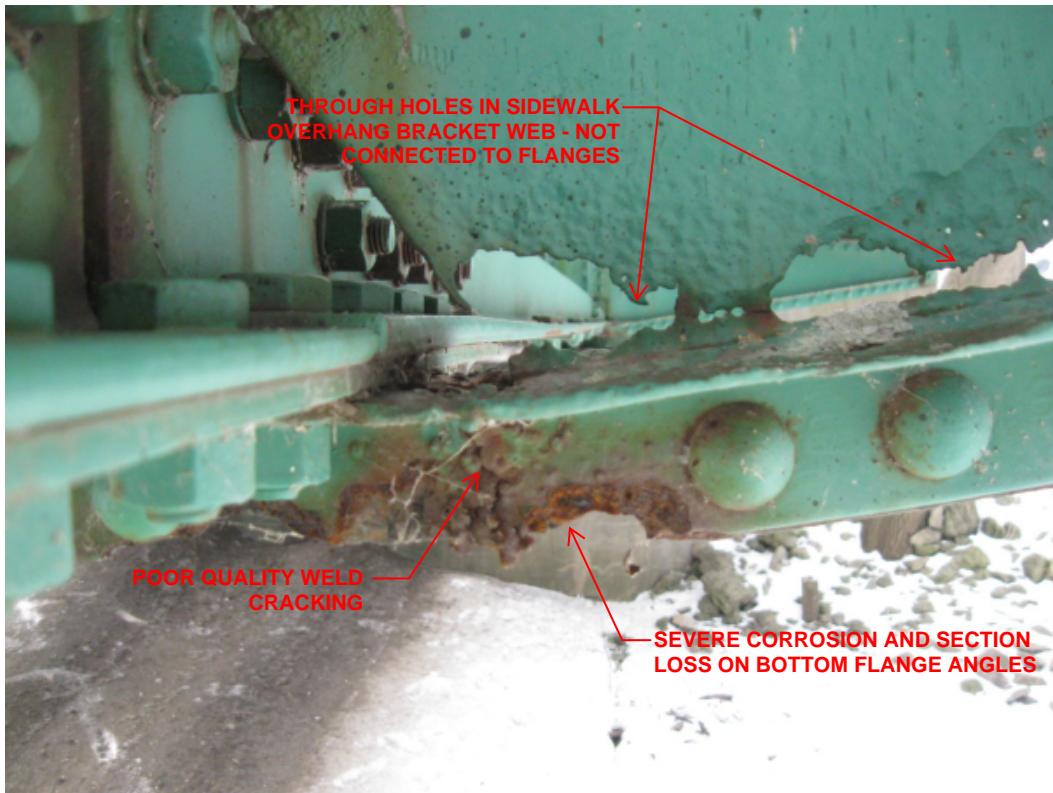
Side View of Sidewalk Overhang Bracket Deterioration
